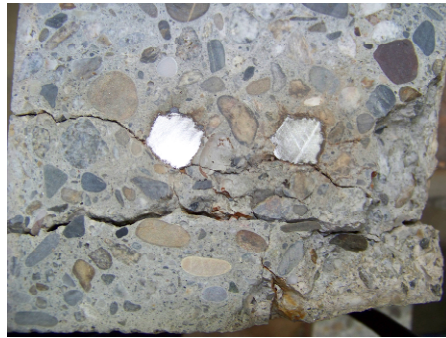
Corrosion cracks located between tensile bars and concrete cover surface
